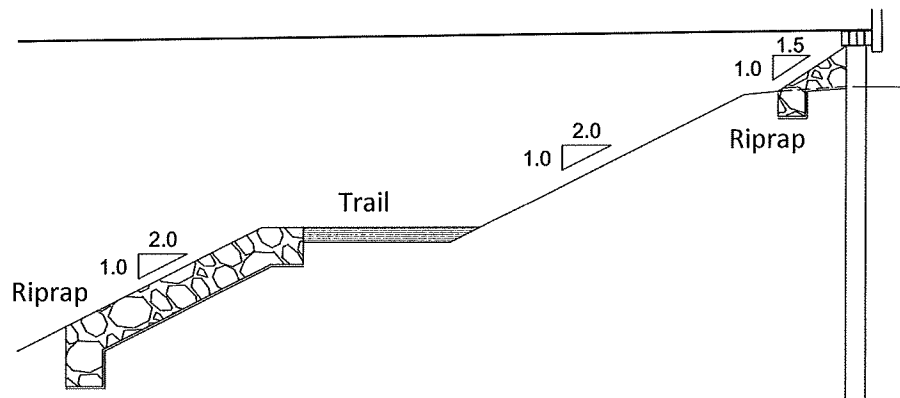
Minimum Side Slope Requirement (Matching Existing Slope)
